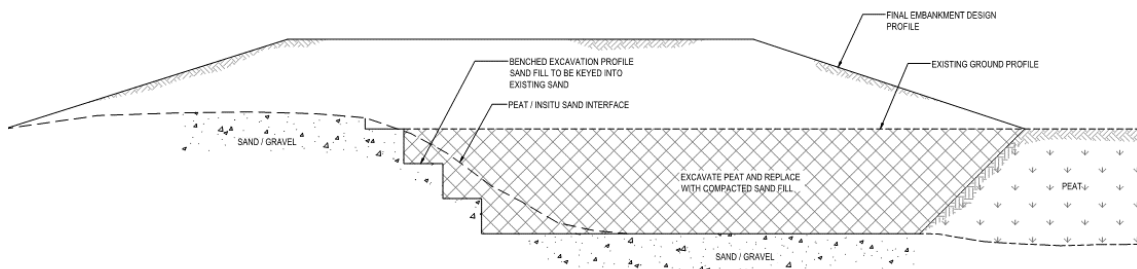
Typical cross section: Peat undercut for embankment on peat and sand
